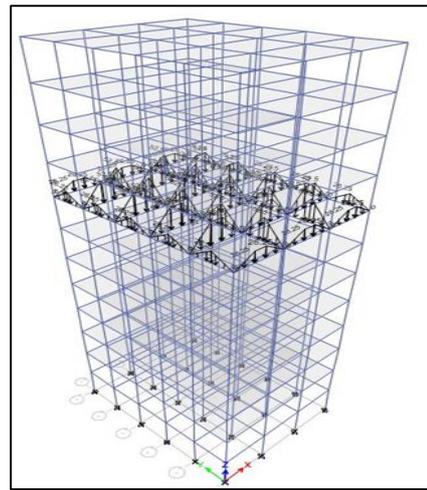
3D view of Frame with lumped mass at 8th floor
